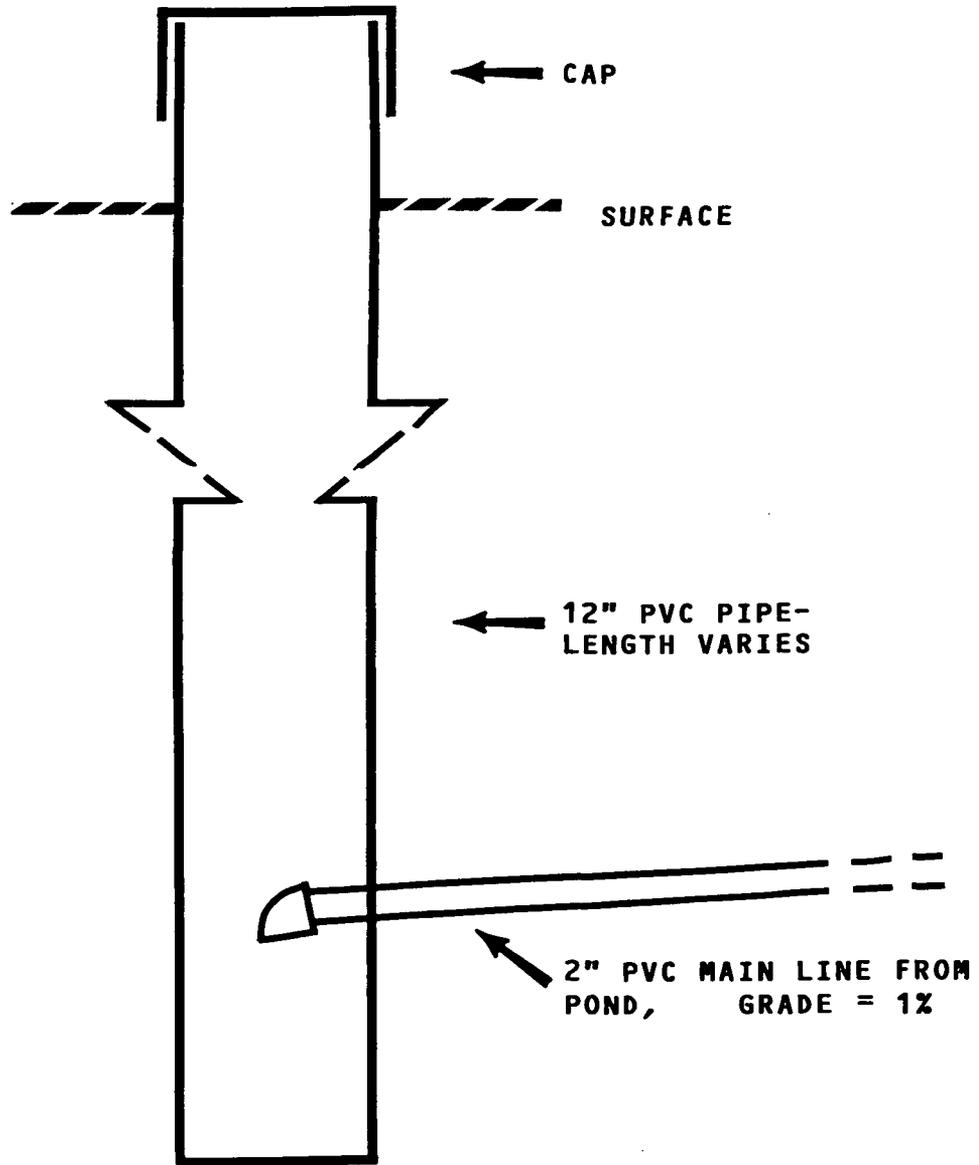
Sump detail showing cap, pipe size and 2" inlet of PVC pipe coming from the leak detection system within the pond bottom.
